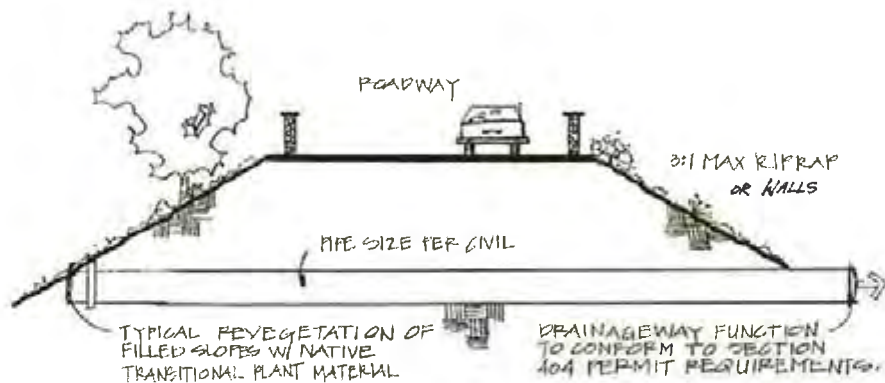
Typical Major Drainageway Crossing Cross Section
